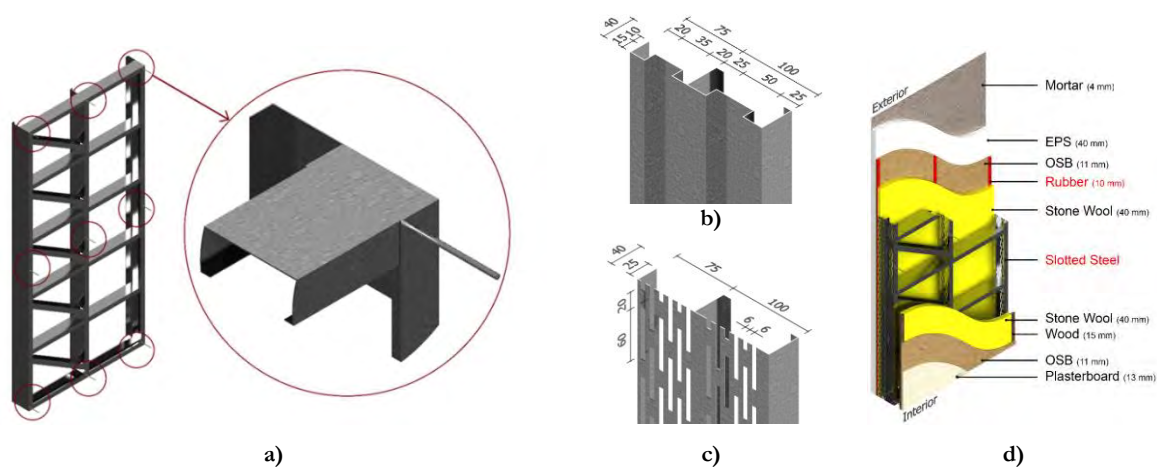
Strategies for the mitigation of thermal bridges: a) fixing bolts instead of steel plate connections; b) male or female studs; c) slotted steel profiles; and d) thin rubber strips [50].
